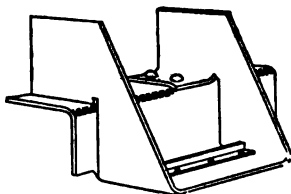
Duplex Steel Wall-hanger for Large Beams
